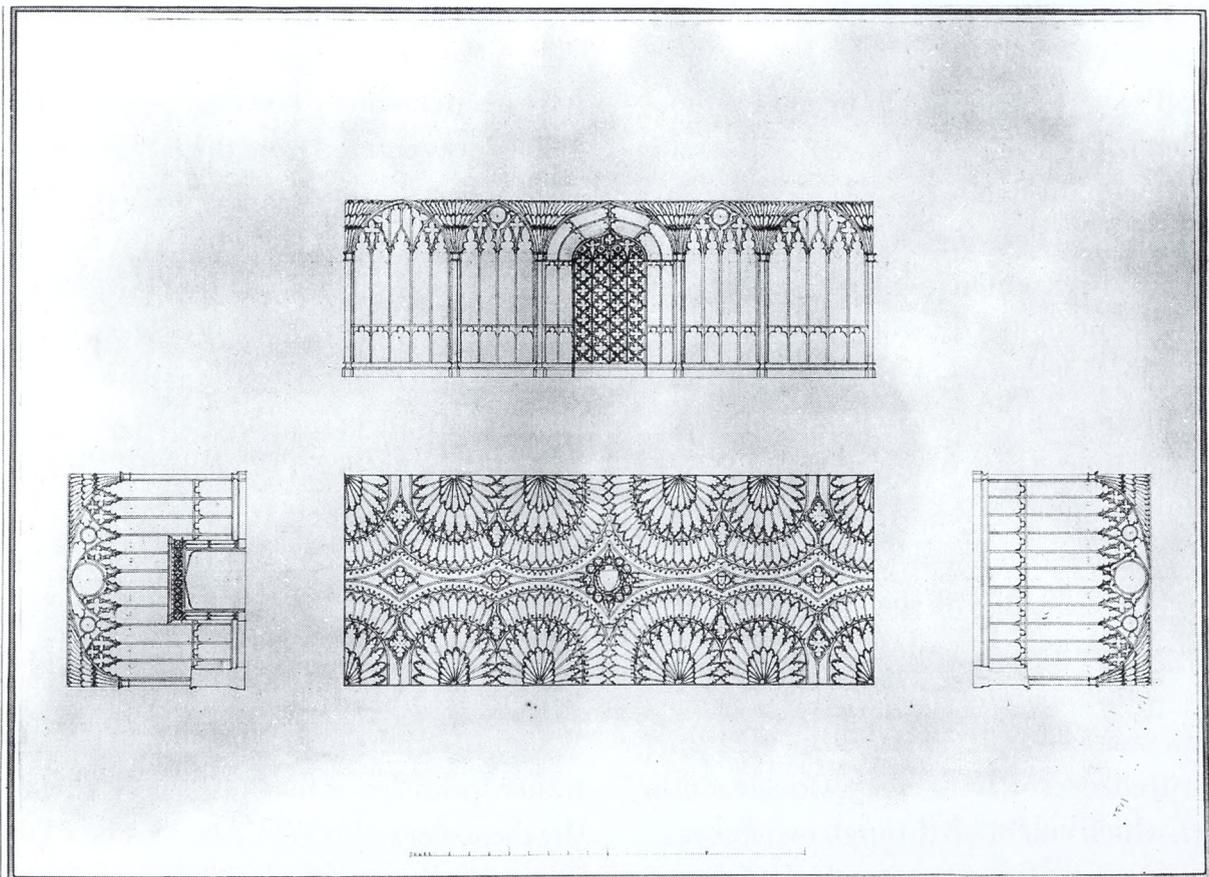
Alternative internal south elevation, east and west elevations and ceiling for the proposed family pew, Audley End House. *English Heritage*.
